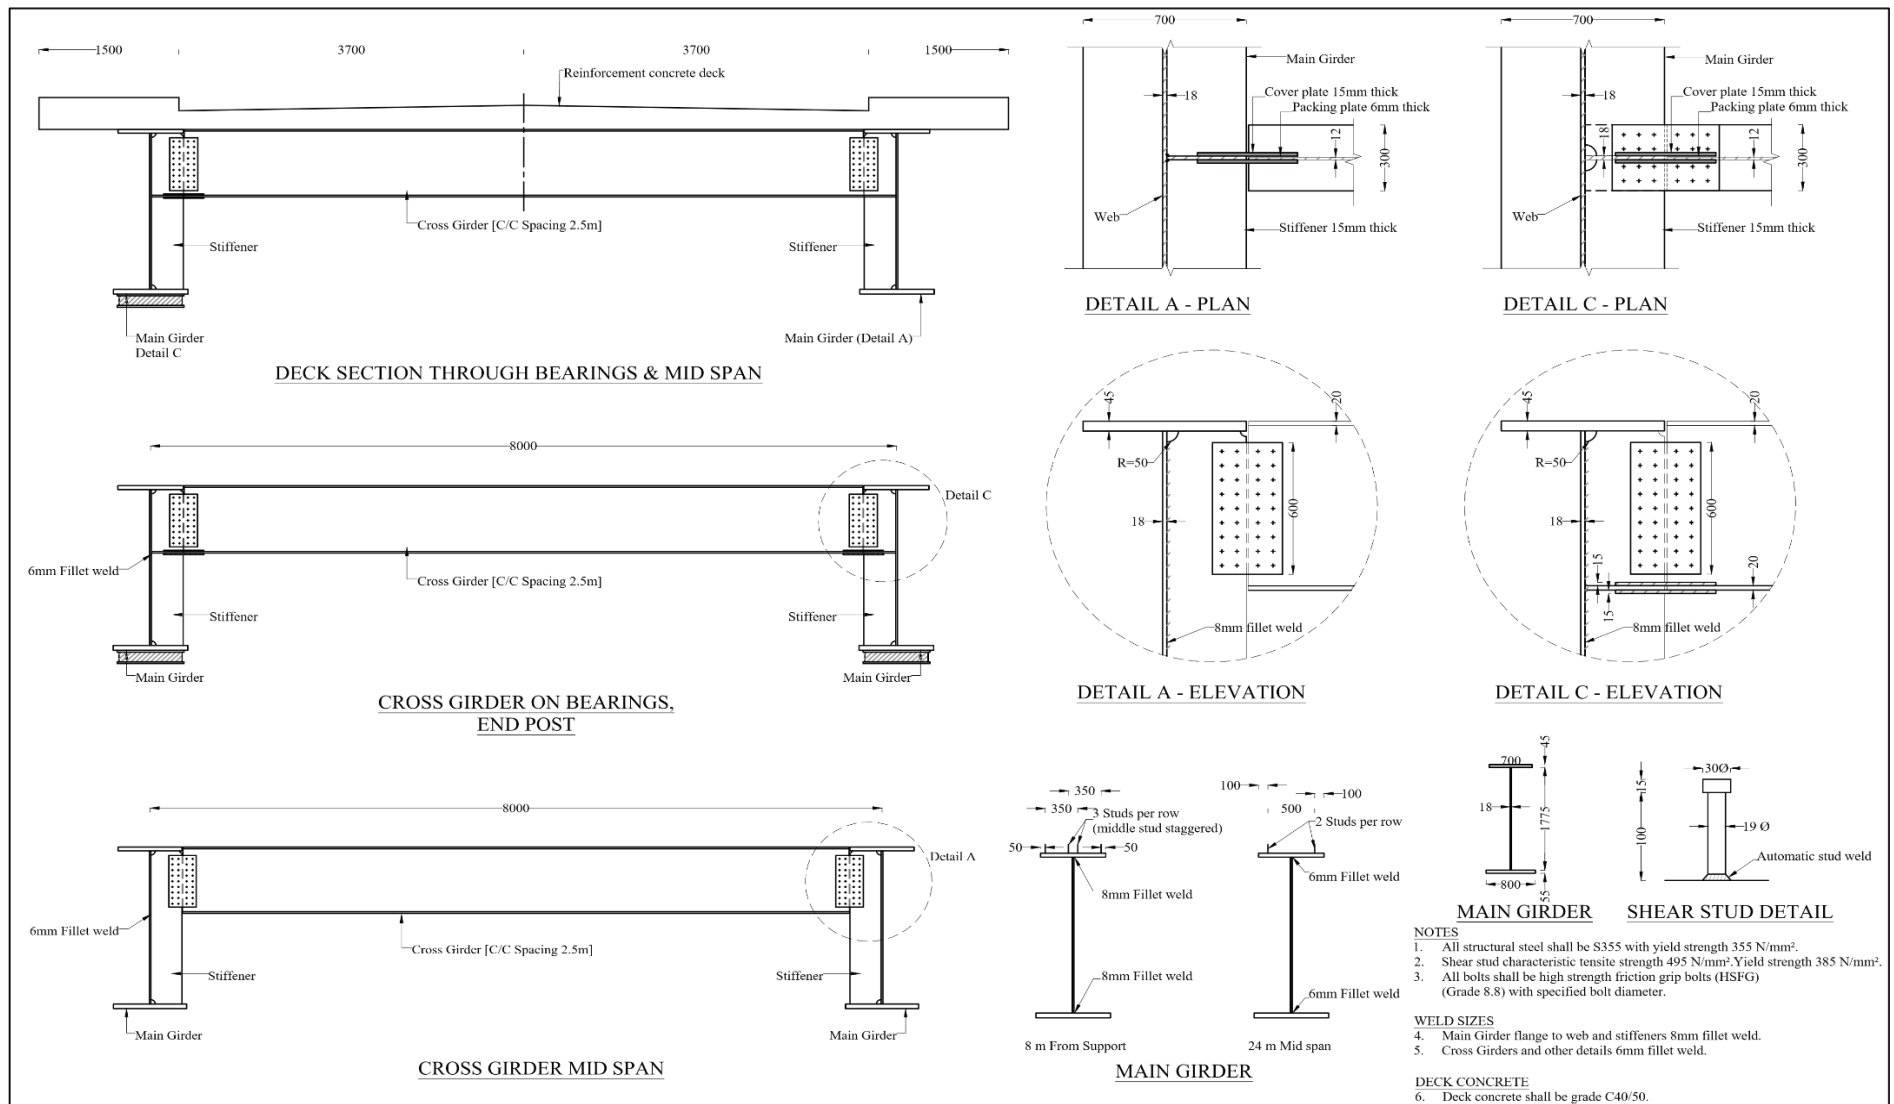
STEEL CONCRETE COMPOSITE LADDER DECK SPAN 40m
